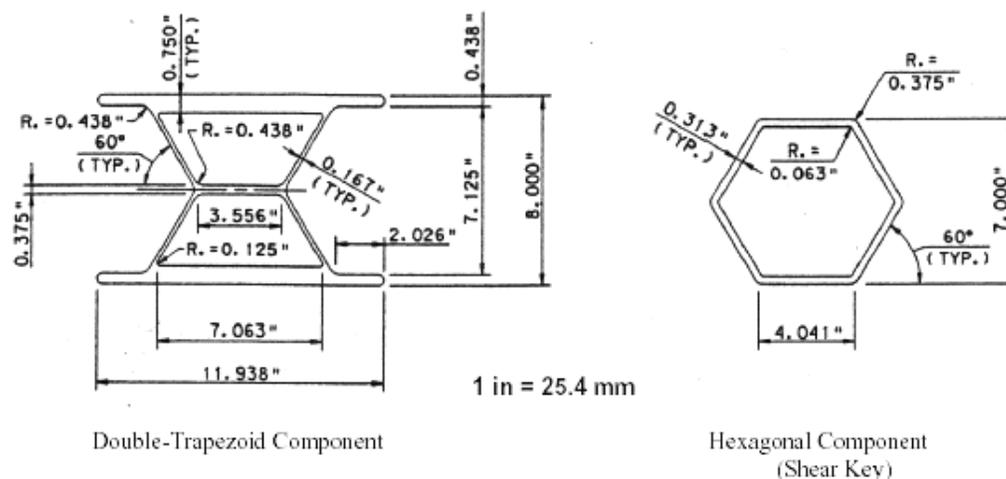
Cross section of composite bridge deck. [Source: Shekar et al. (34).]
